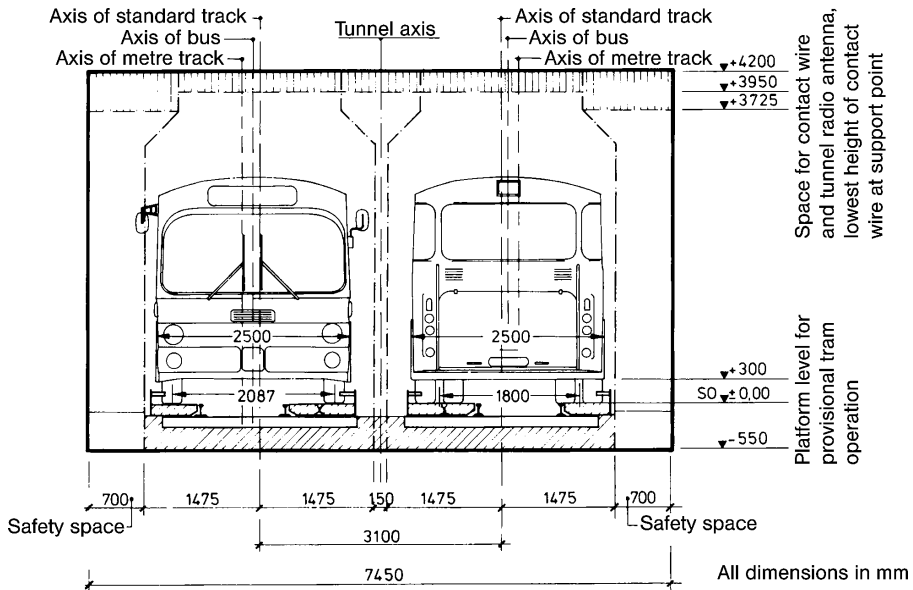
Mechanical guidance for buses. Rectangular cross-section for straight stretches of two-way tunnel [15].
